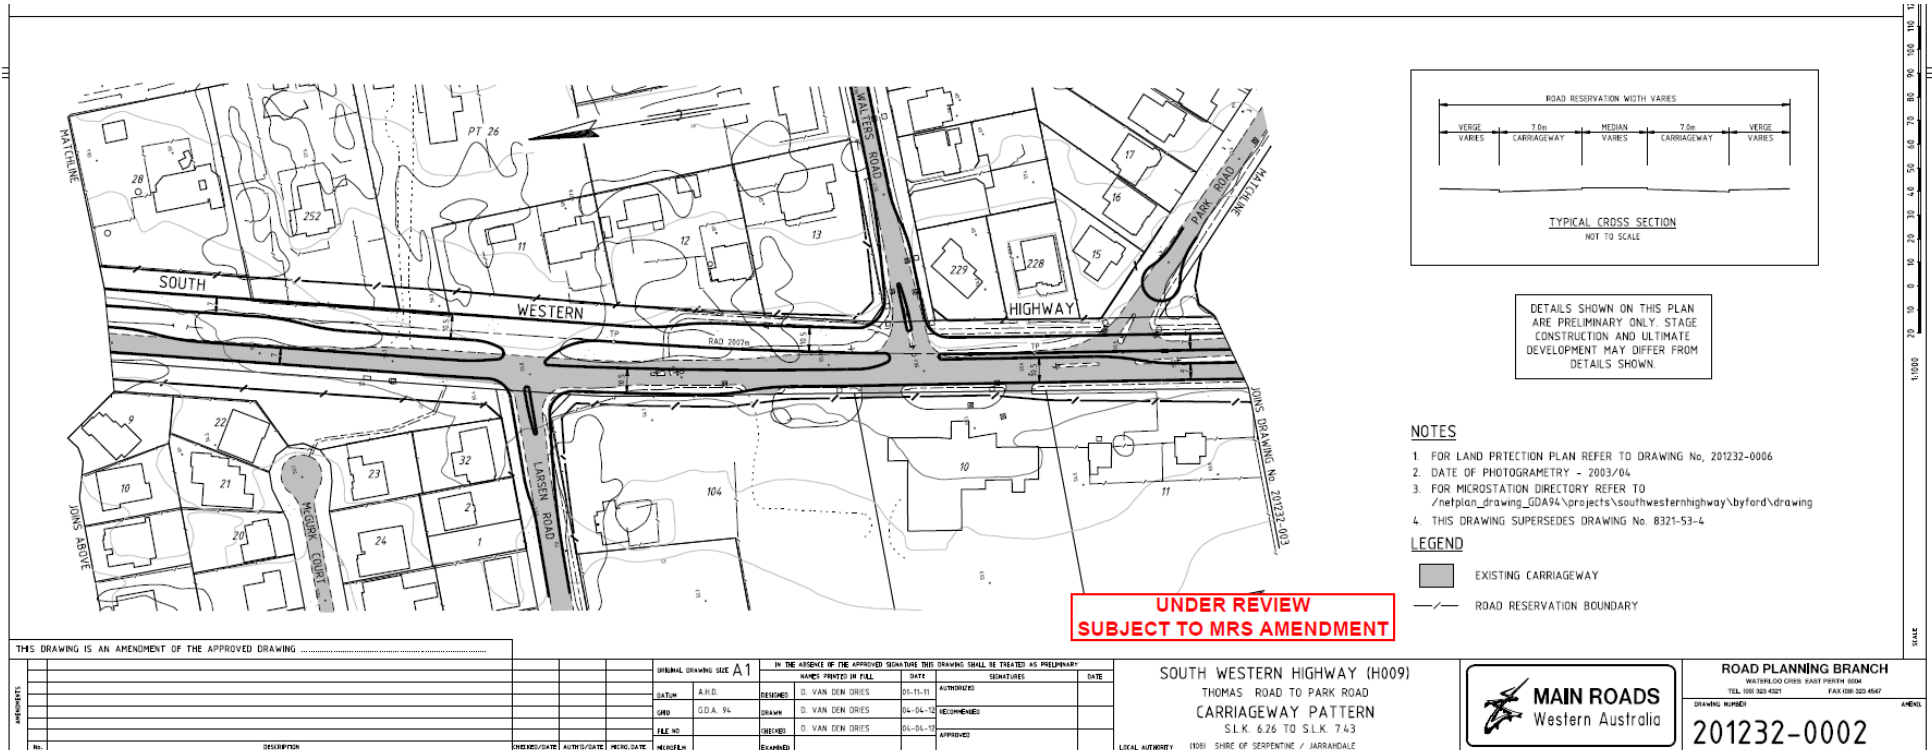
Proposed future upgrades on South Western Highway in the vicinity of the subject site
